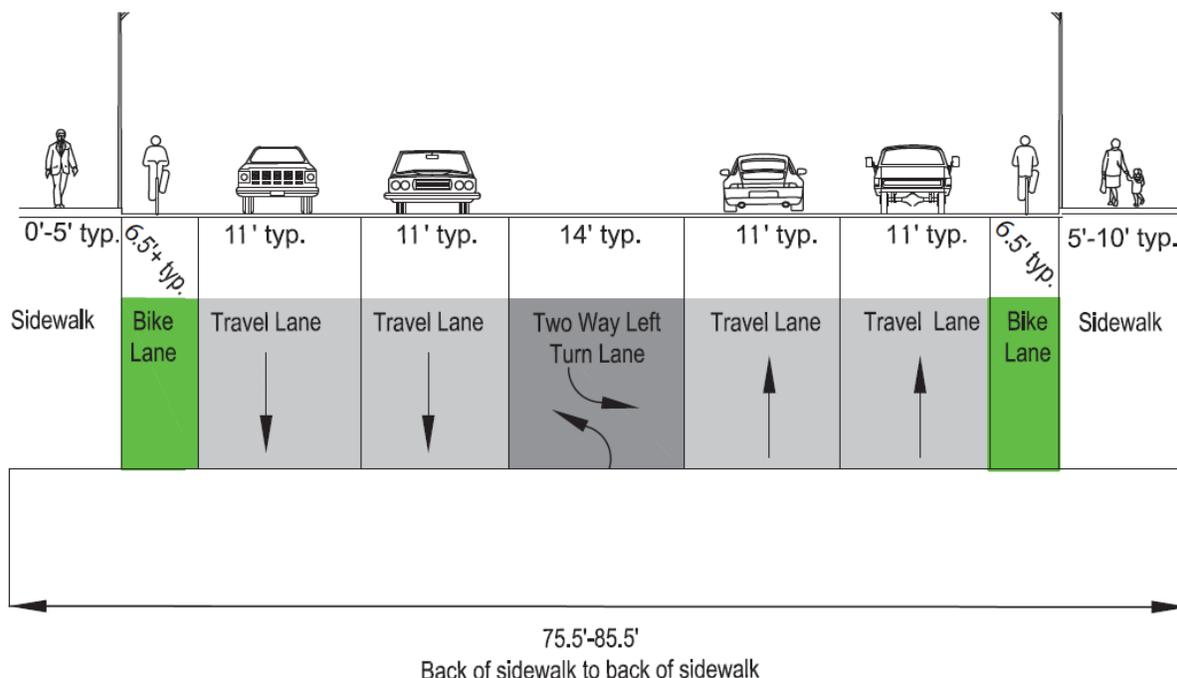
Proposed State Route 1 Cross-Section through Fort Bragg, Oak Street to Maple Street
